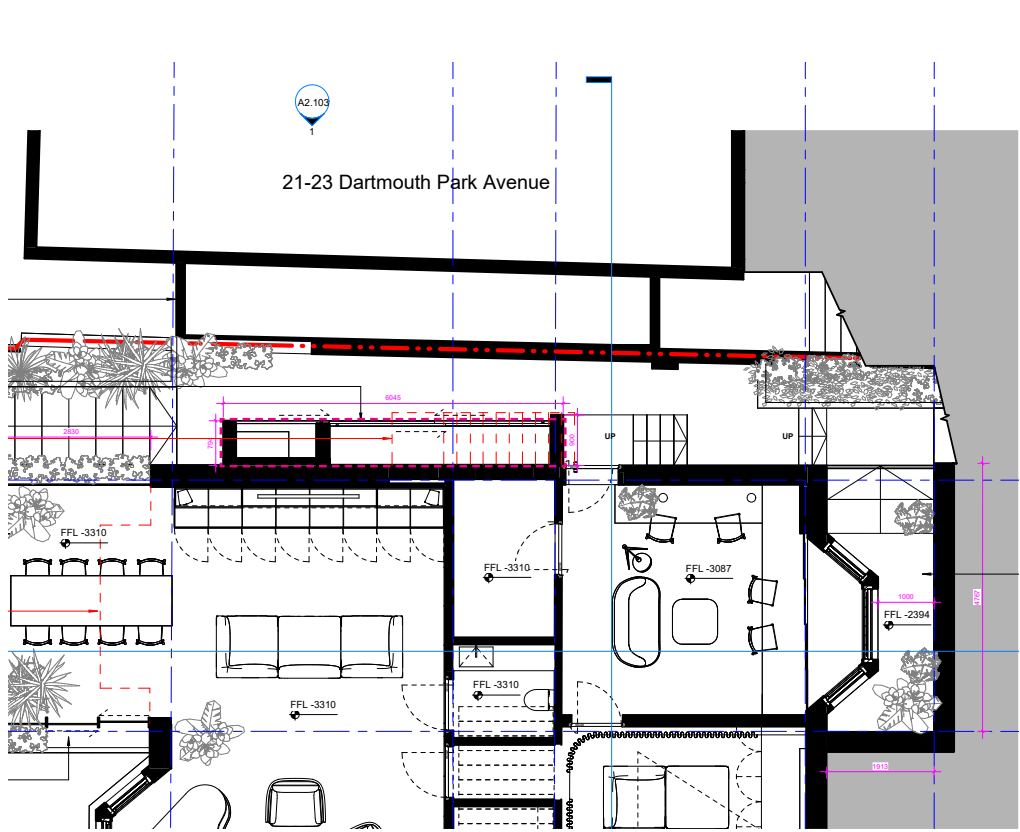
Lower Ground Floor Plan and North Elevation with revised side storage unit
